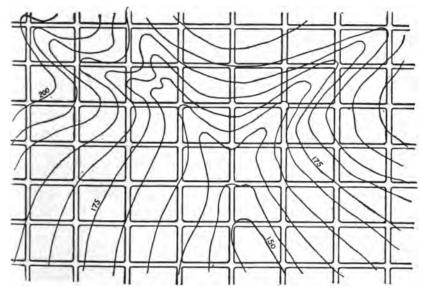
LAYOUT OF STREETS WITHOUT REGARD TO TOPOGRAPHY.
